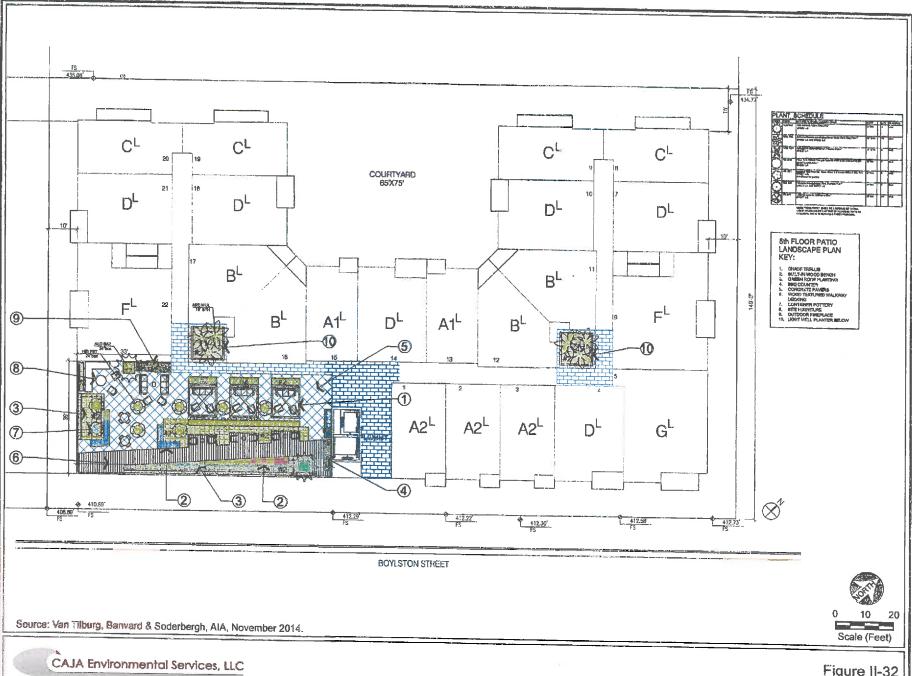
R5 Floor Patio Plan-Preliminary Landscape Plan
